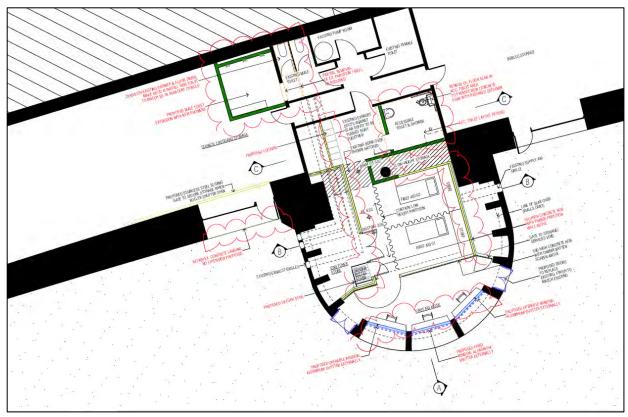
Proposed modifications to First Aid Facilities and Tunnel 3.
